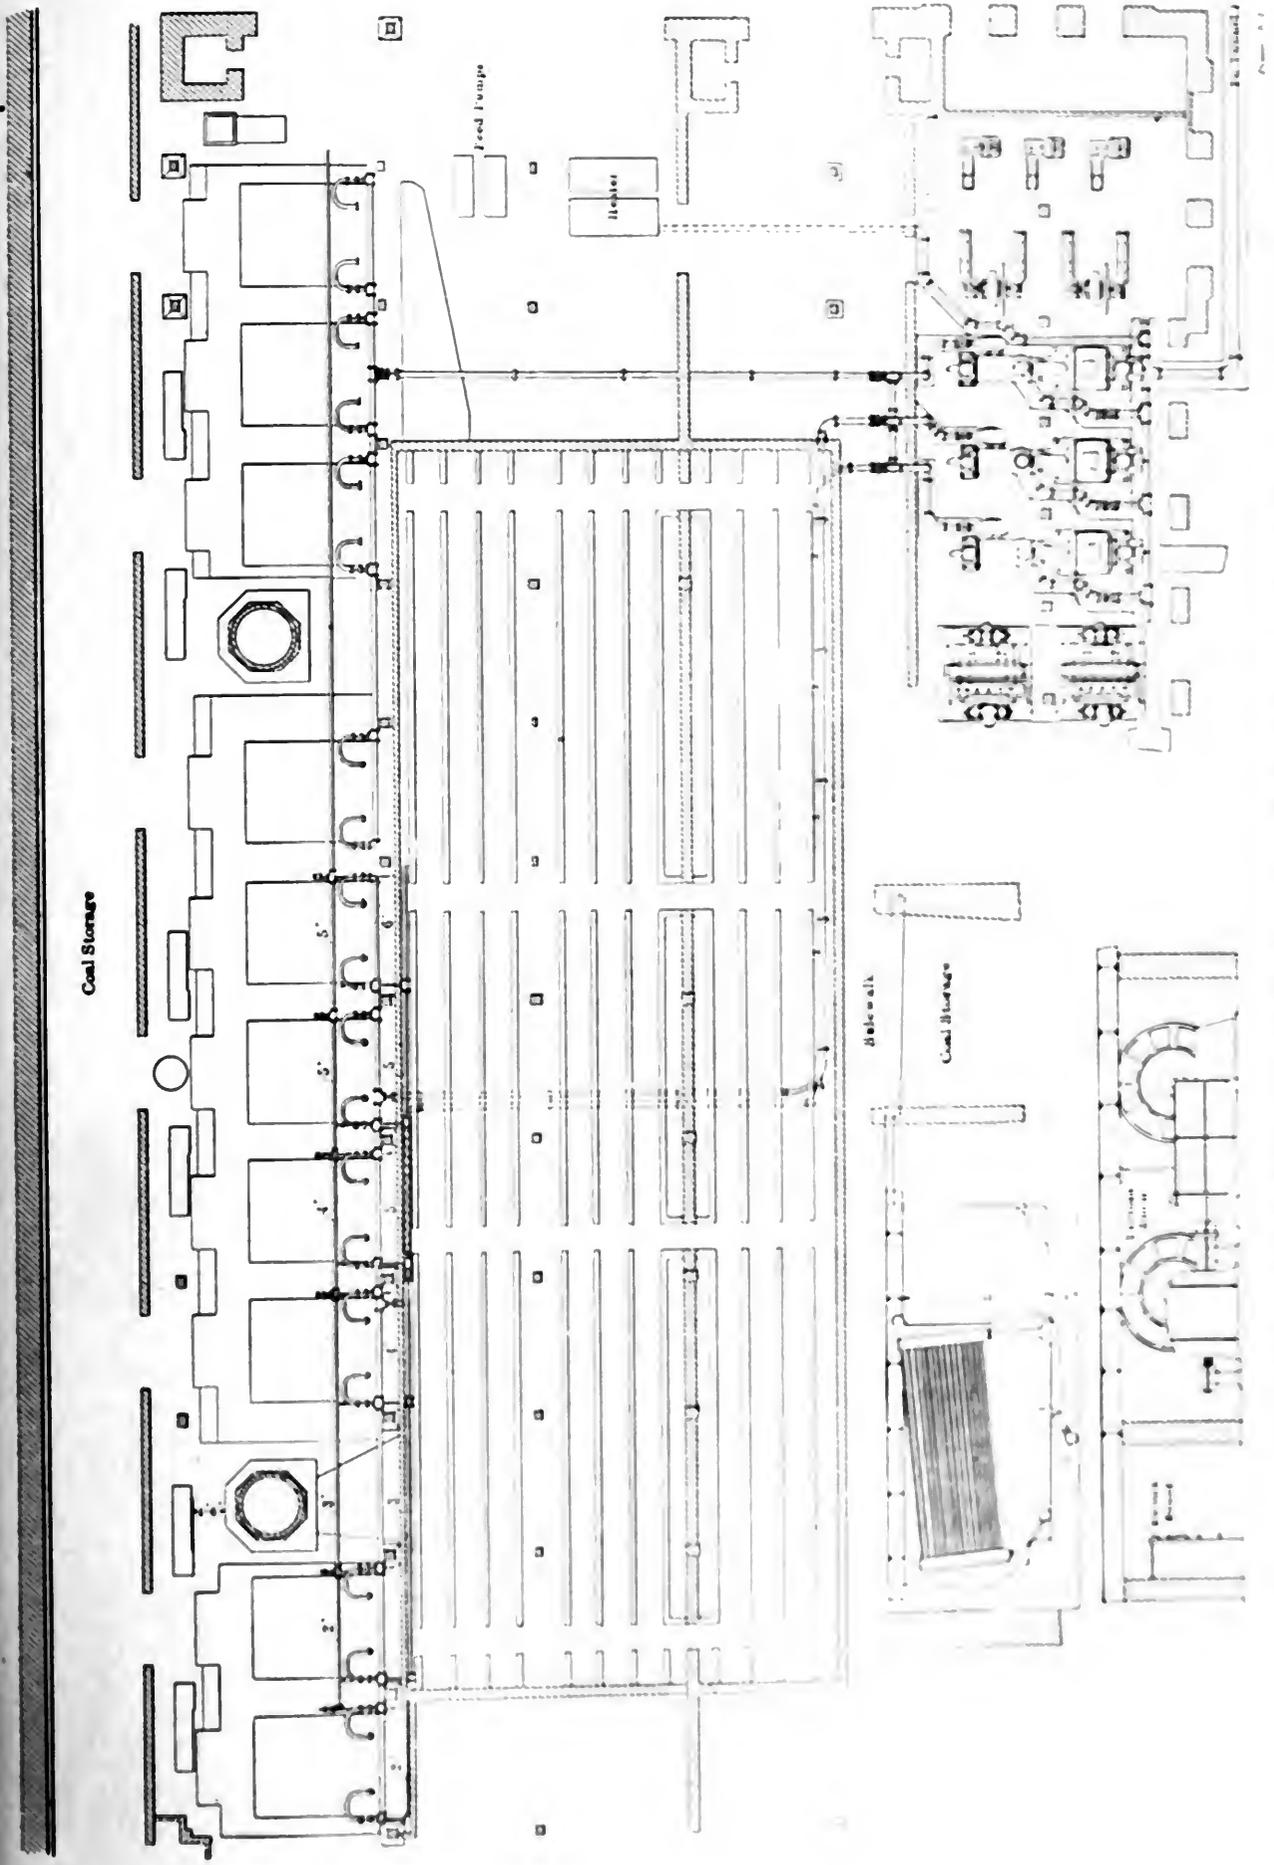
PLAN OF POWER PLANT AND SECTIONAL ELEVATIONS OF BOILER AND TURBINE ROOMS
